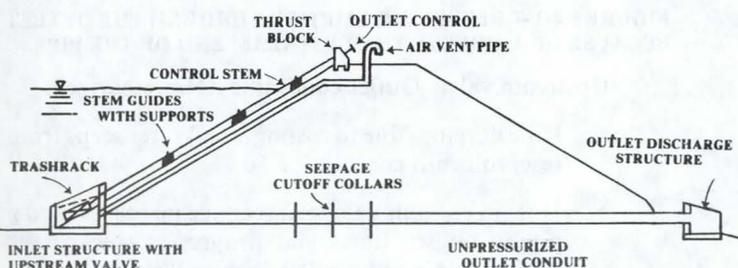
TYPICAL OUTLET CONFIGURATION WITH UPSTREAM VALVE
